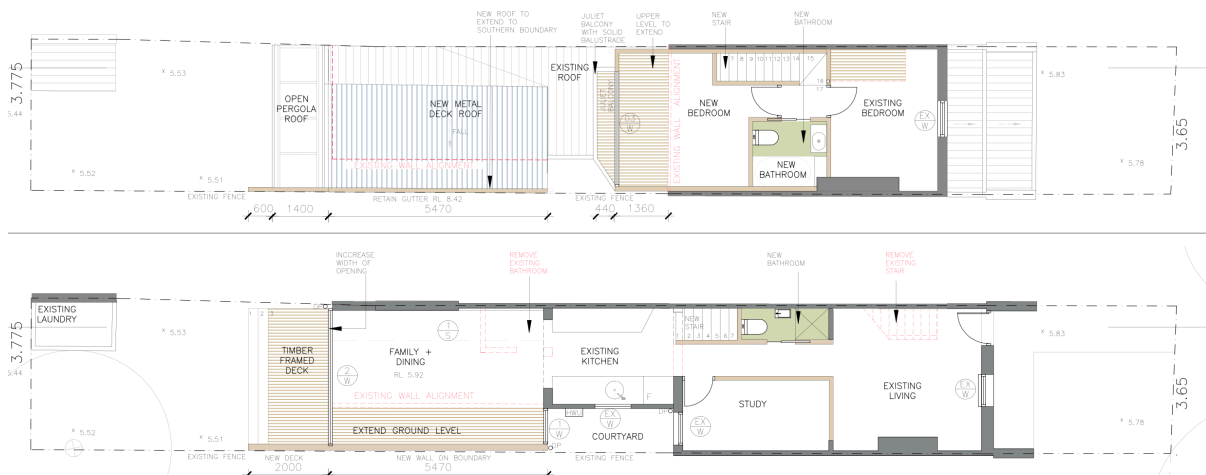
Ground and First Floor plans. Modifications shown coloured. Source: Marston Architects
